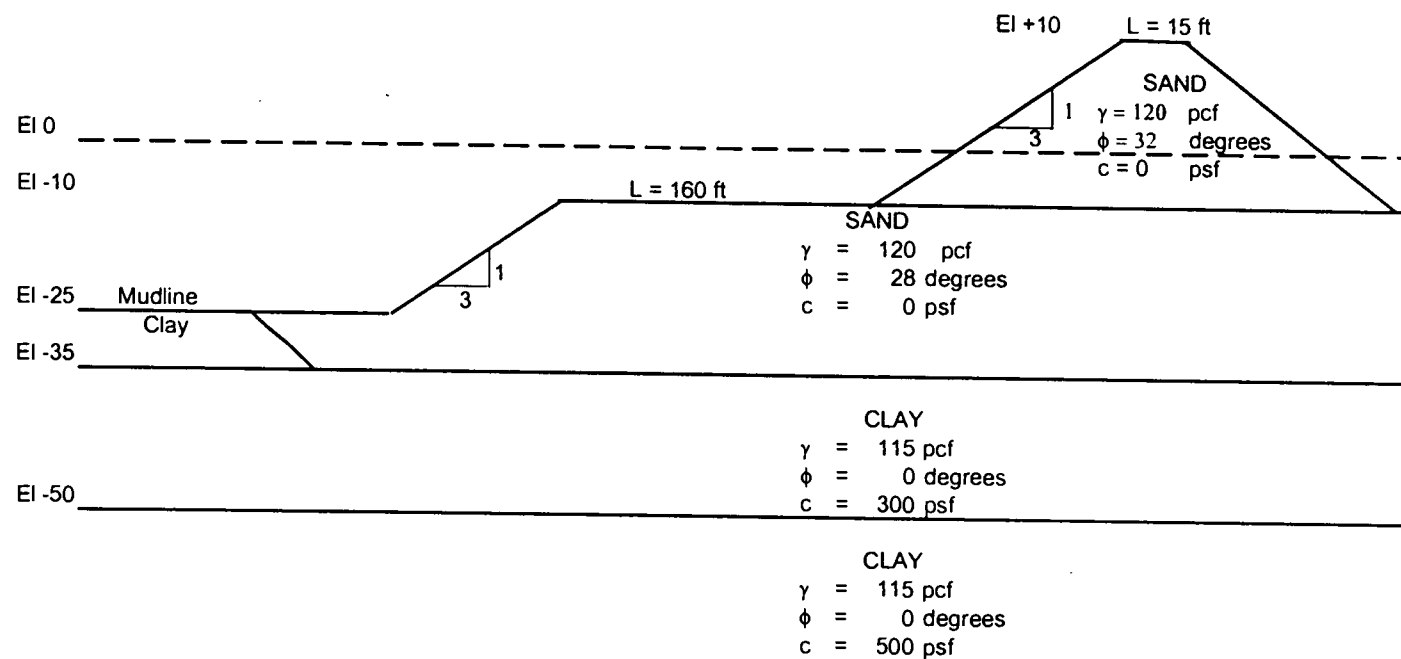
Recommended Dike Section Site 2 - El. +10
